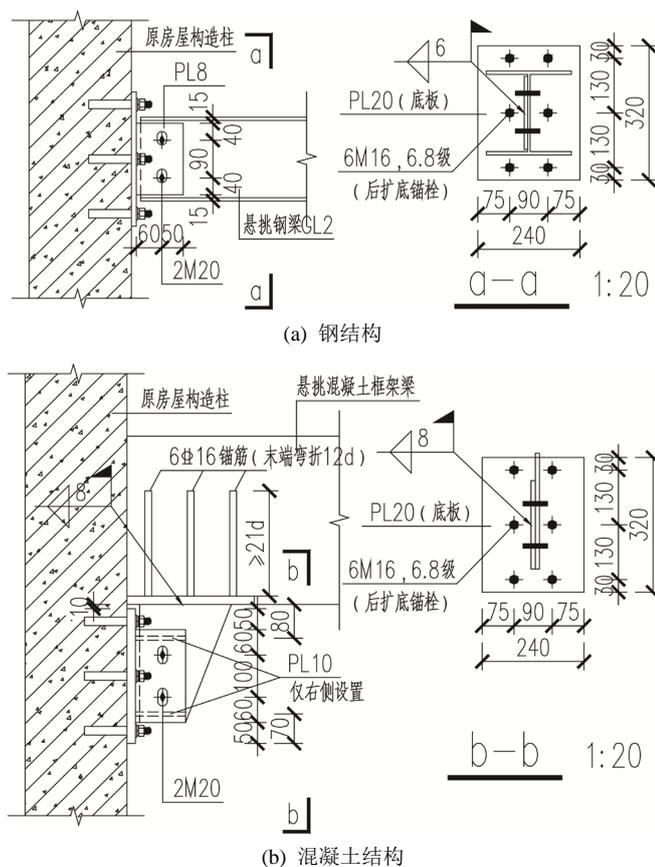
Connection between the cantilever beam and the structural column of the residential building
